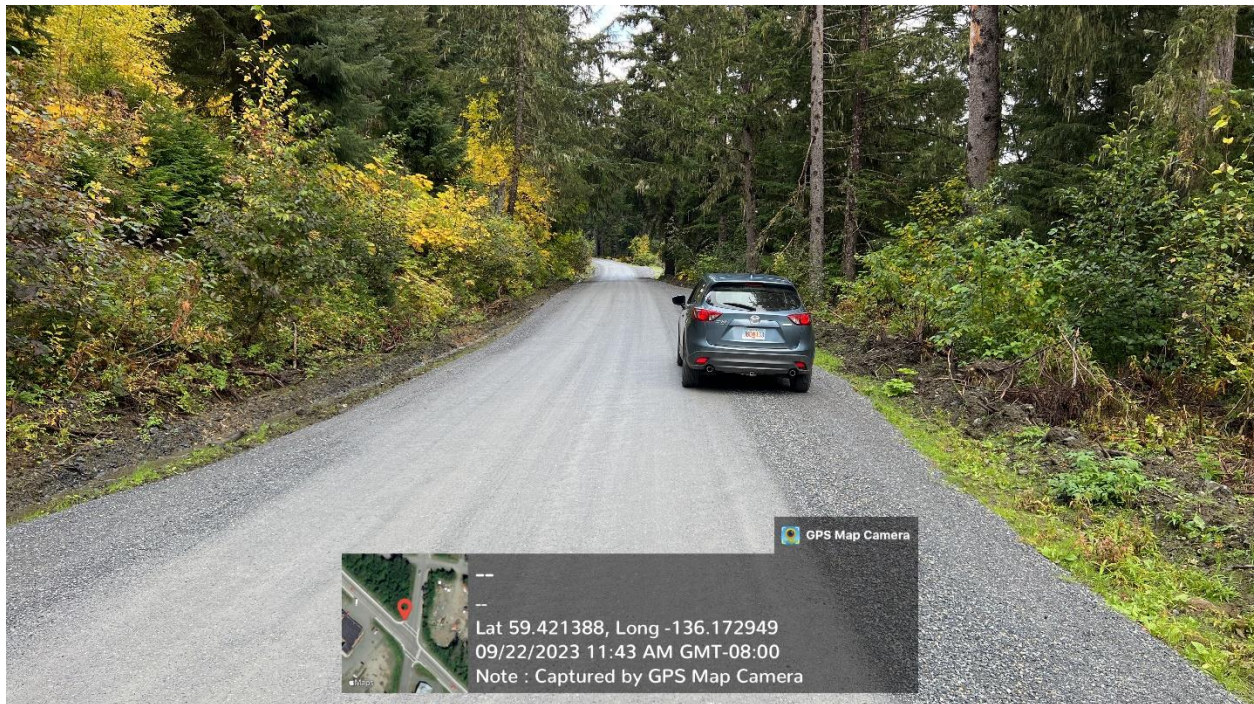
Porcupine Trail Road Phase I start of work, photo facing end of road.
